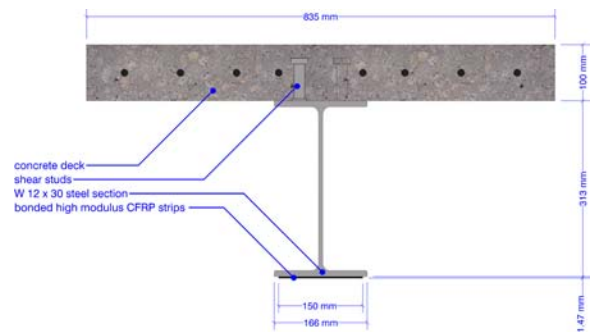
Cross-section of steel-concrete composite beams strengthened with high modulus CFRP
